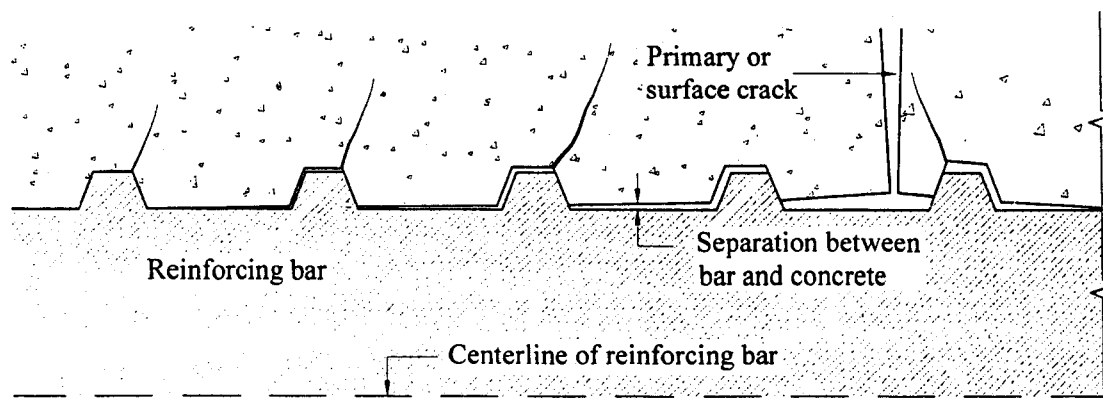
Separation Near a Primary Crack Between Reinforcing Bar and Concrete
